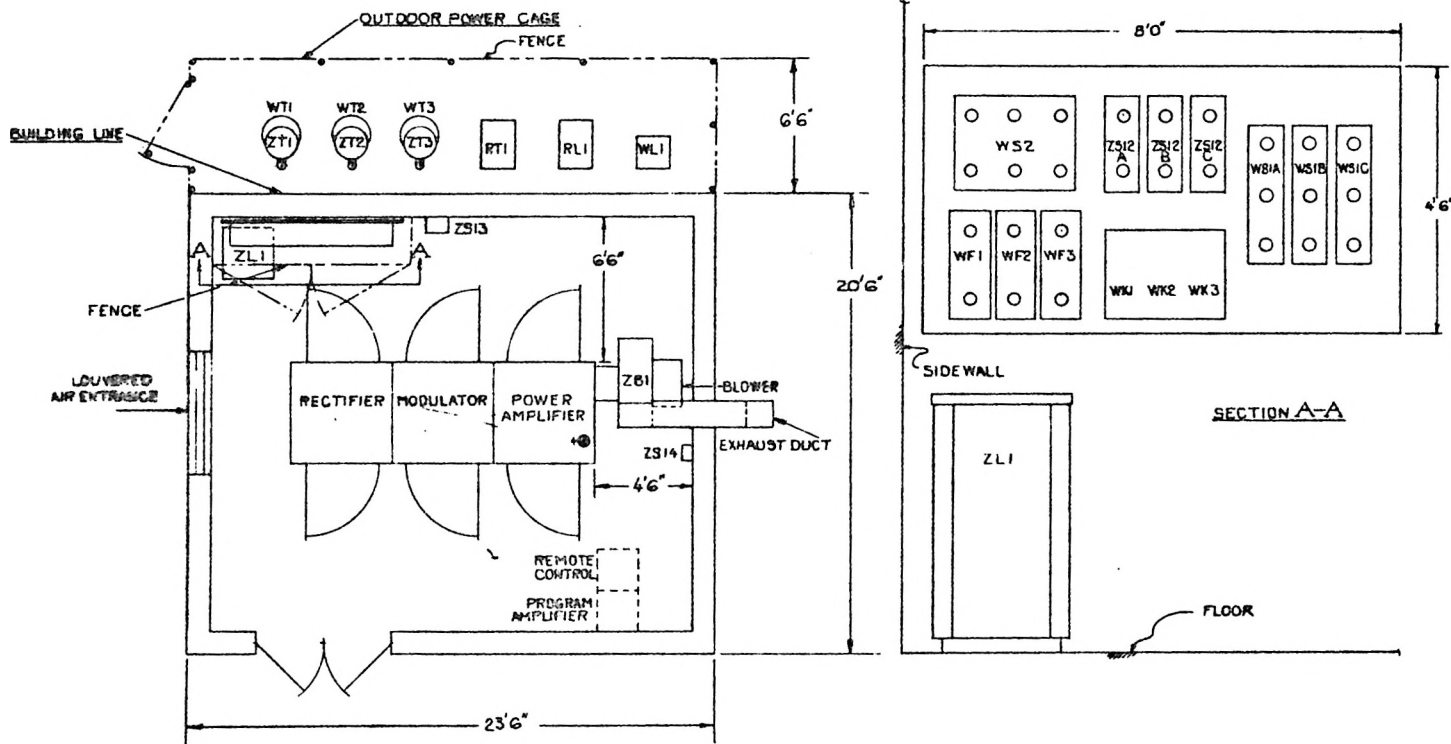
Typical Station Layout for 2400/4160-Volt Operation (D-7669896, Sheet 2)
